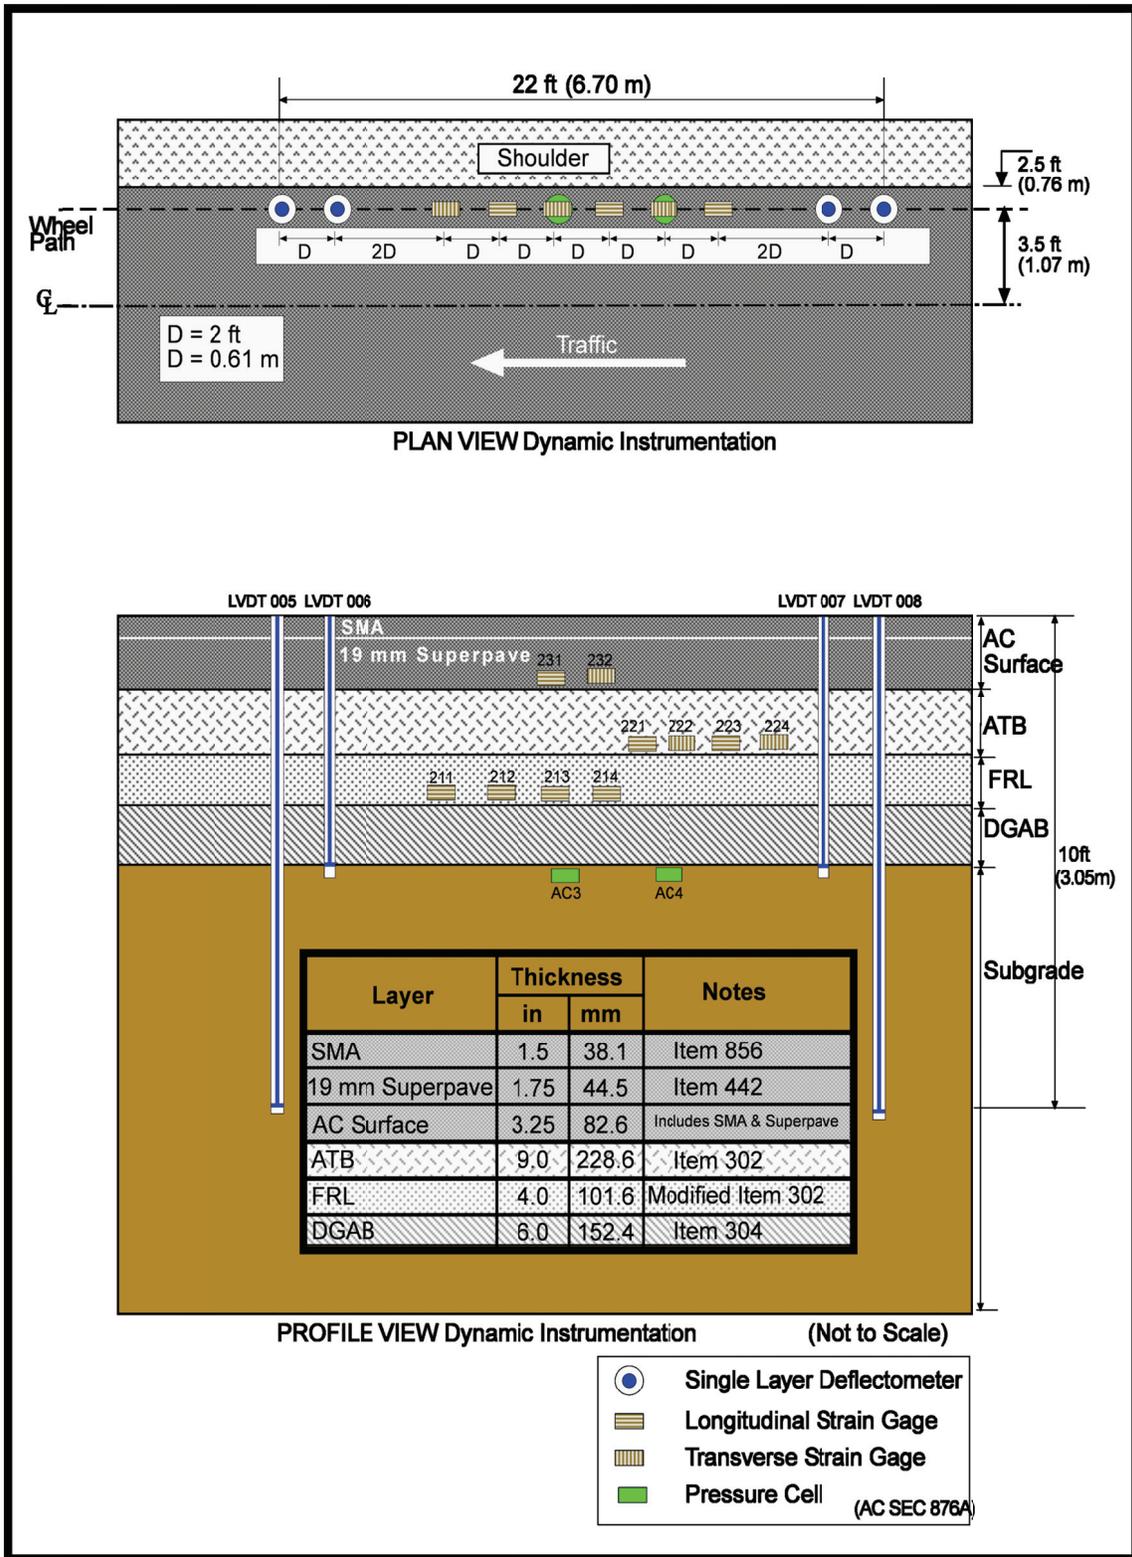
Instrumentation Plan and Profile Views for AC Section 876A
